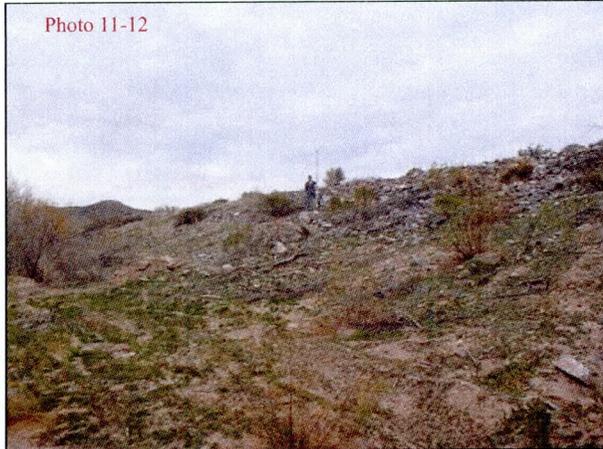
Bullard Avenue left bank fill for bridge approach, looking upstream.
